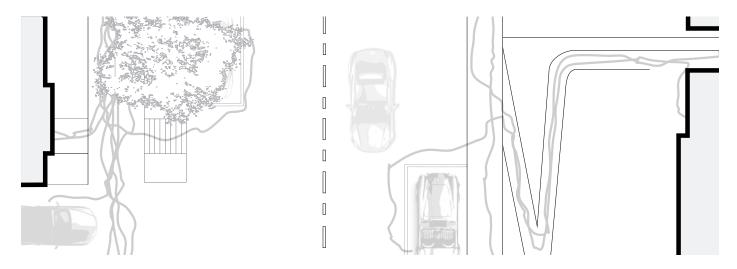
Plan 1:200 showing pedestrian walking routes and potential neighbourly interactions.
